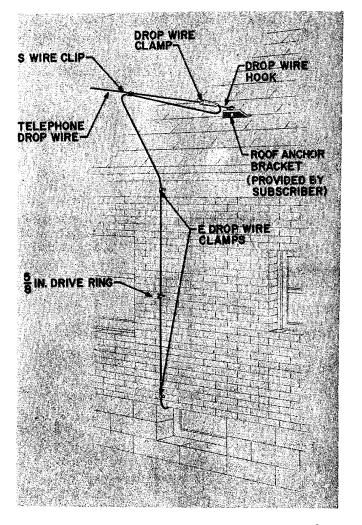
Drop Wire Attached to Roof Anchor Bracket
